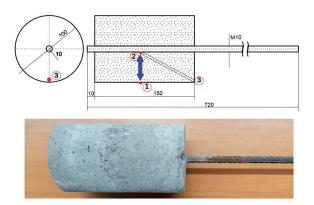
Samples for testing along with marking the location of measuring thermocouples (all dimensions in mm)
